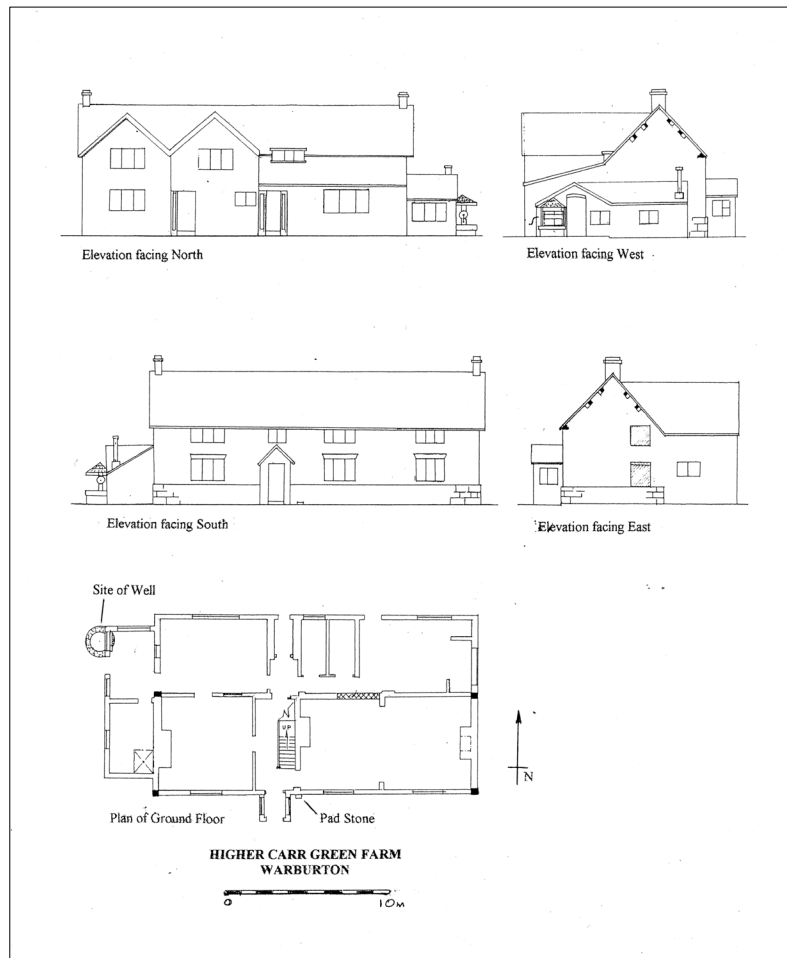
(right): Ground floor plan and elevations of Carr Green Farmhouse.
